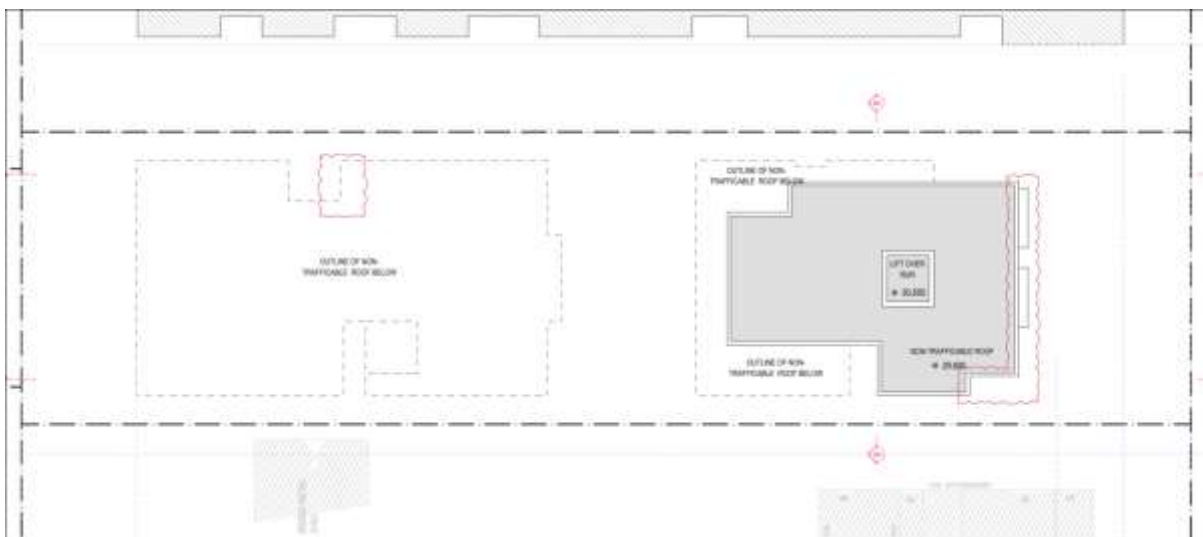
LEC approved roof plan (east building) - DA 2021/106 (LEC No. 2020/250687)
